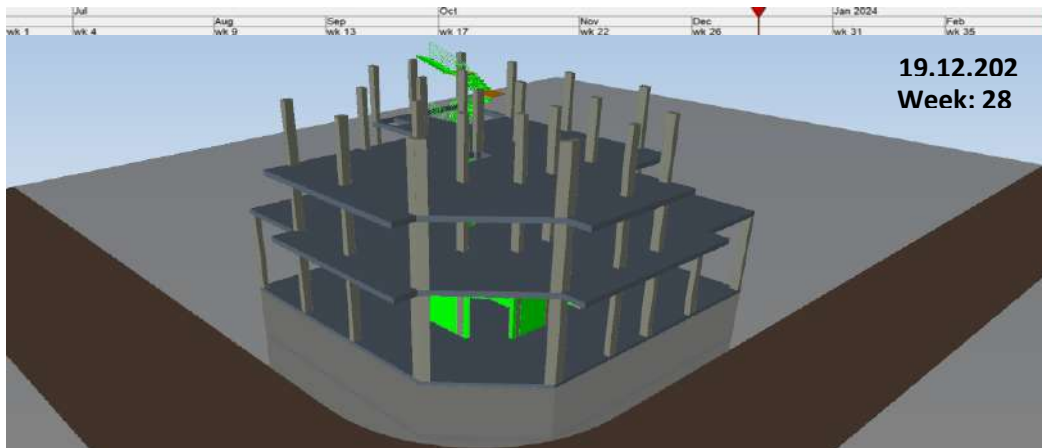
Columns and staircase work for the 2nd floor and masonry work for the ground floor
